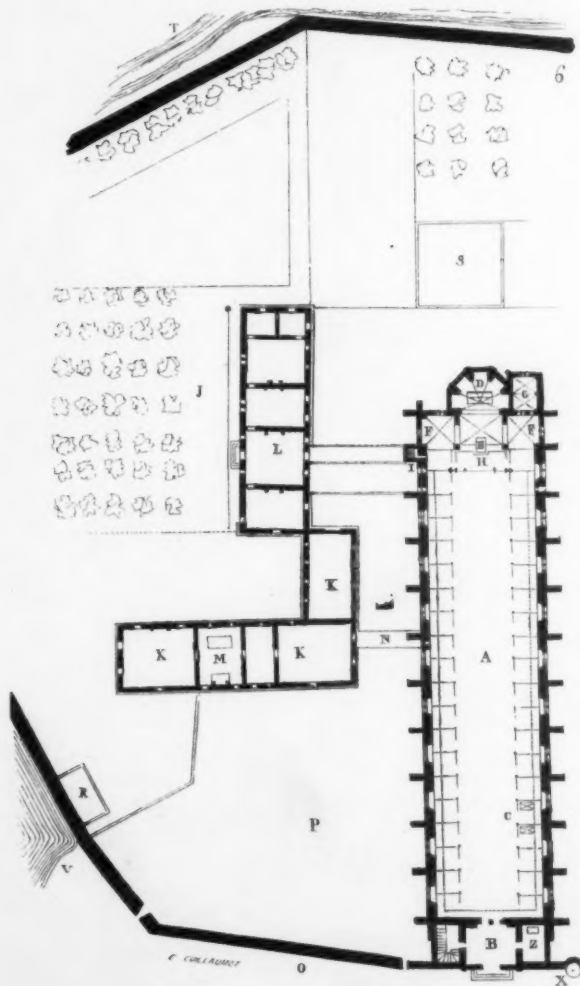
PLAN OF HOSPITAL AT TONNERRE.
